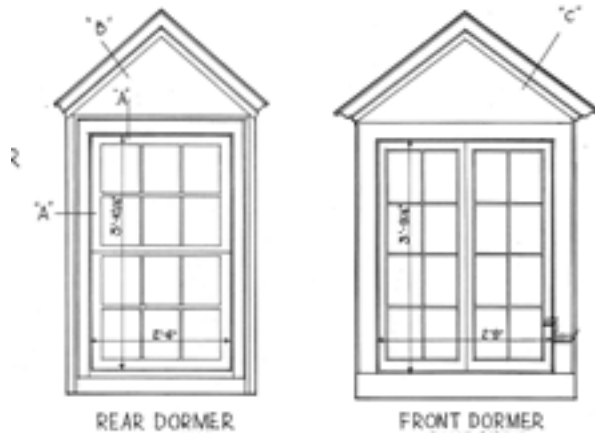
Dormer Details, Historic American Building Survey, Fawcett House, 1936, Library of Congress.
